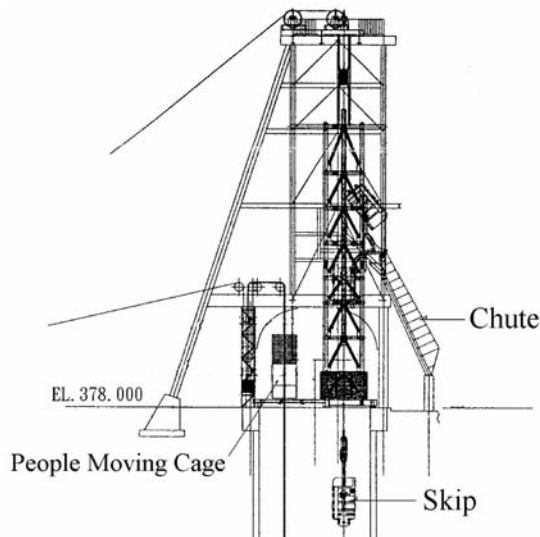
The Mucking Equipment at the Fresh Air Shaft Portal
